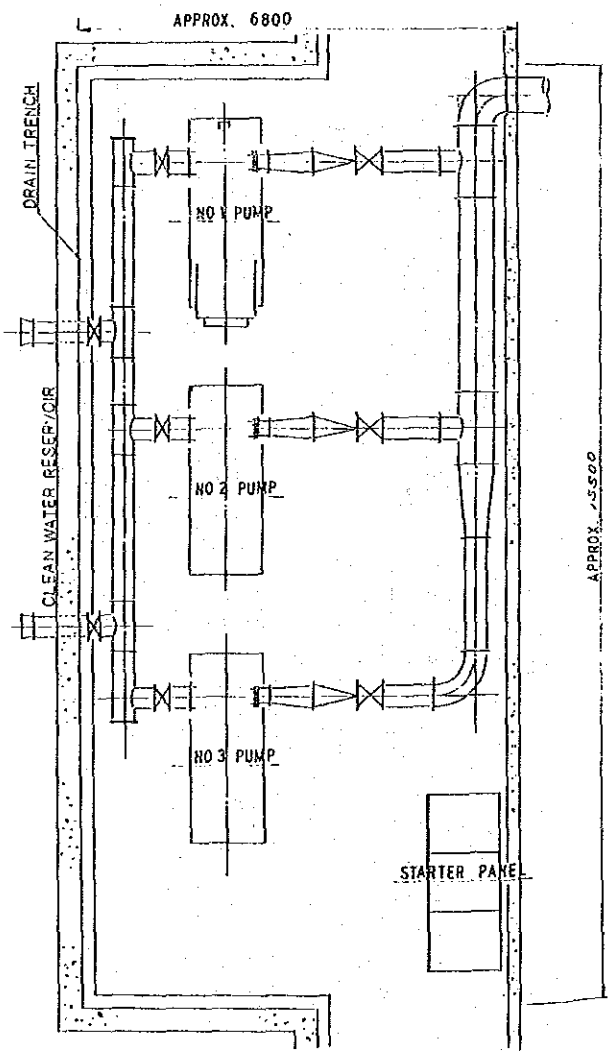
PLAN OF DISTRIBUTION PUMP STATION
